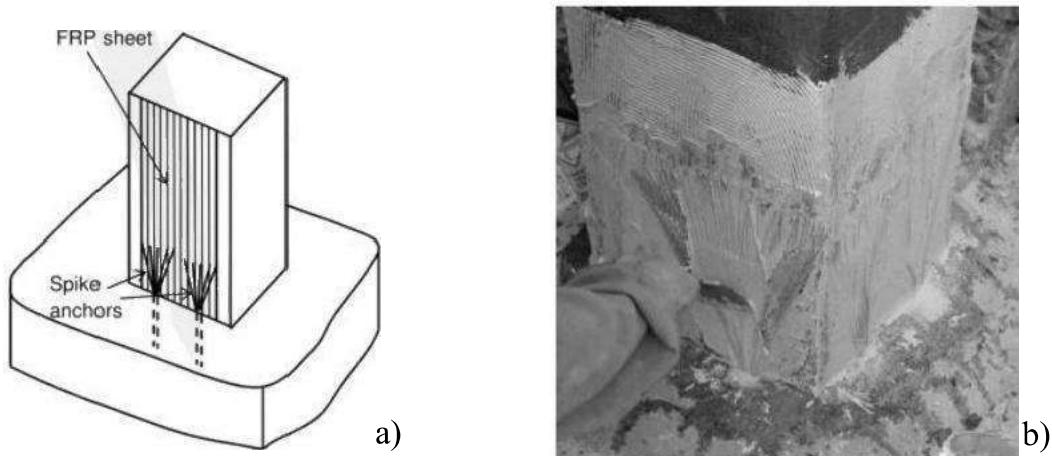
Use of spike anchors in flexural strengthening of columns with FRP sheets:(a)concept,(b)photo
